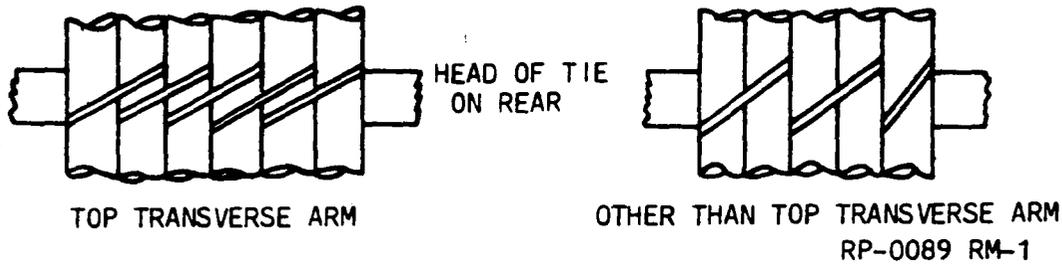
SECURING FIRST LAYER OF CABLE ON VERTICAL SIDE OF DISTRIBUTING FRAME (PAR. 5.31)
